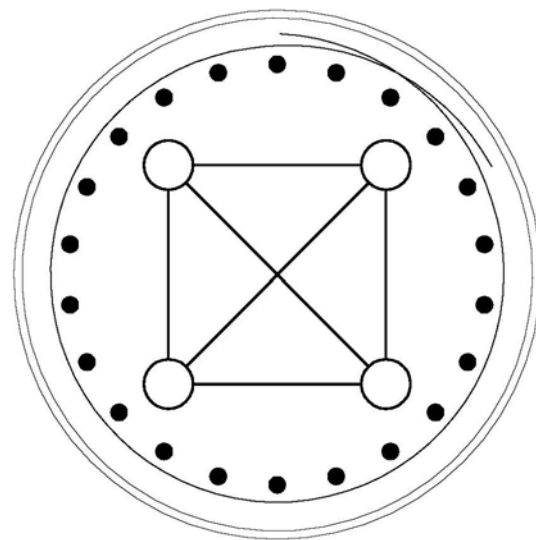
& Figure 4: Typical view of the caisson reinforcing cage illustrating the steel tubes for Crosshole Sonic Log (CSL) testing. Note the conduit layout facilitated two diagonal and four perimeter scans between the four tubes.
